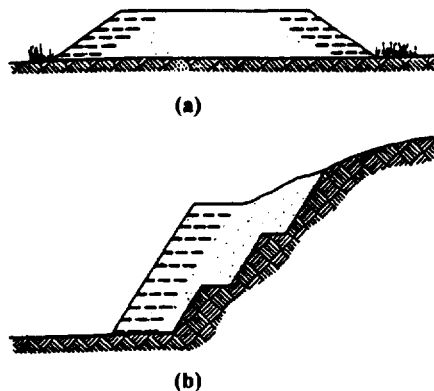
Reinforced slopes: (a) embankment and (b) landslide repair (Bonaparte et al, 1985)
